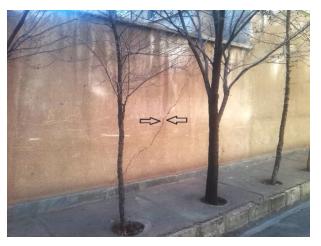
Swelling in marls and creating crack on the walls
